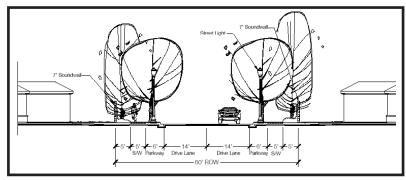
Collector Street w/Soundwall on 2 Sides- Woodbridge by Del Webb, Section R
